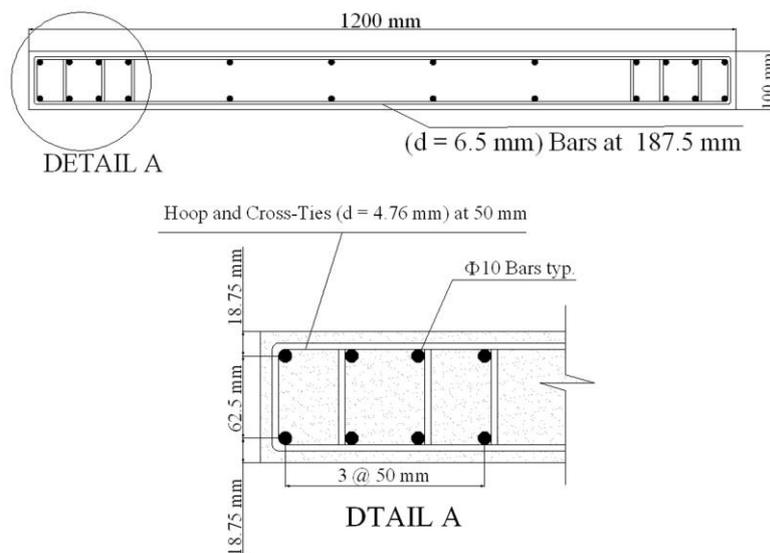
The detail of the specimen RW1 tested by Thomsen and Wallace [13]
